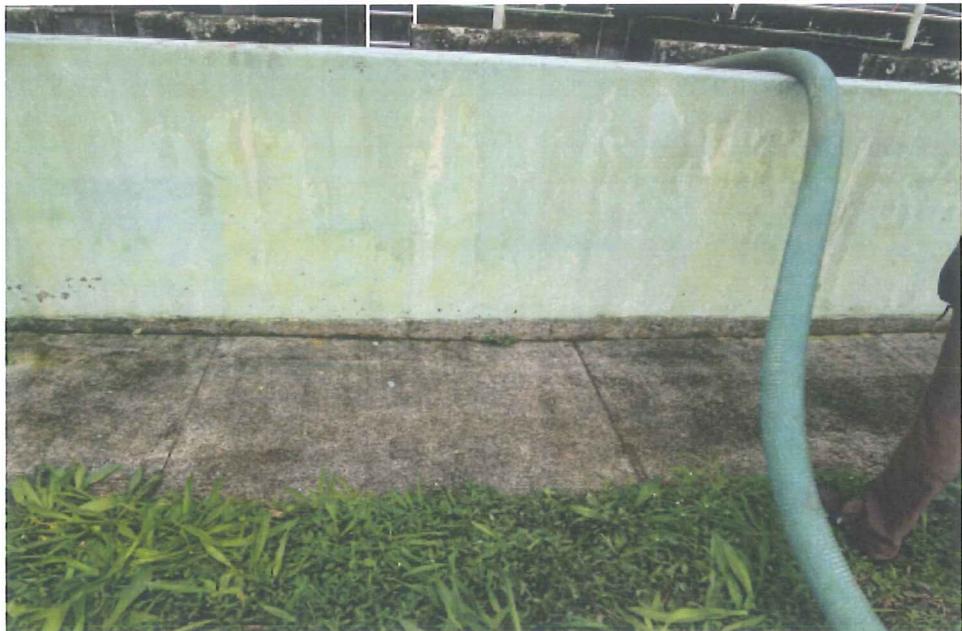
NORTH VIEW OF INLET CHANNEL. NOTE GROUND SETTLEMENT/SEPARATION AT BASE OF WALL
